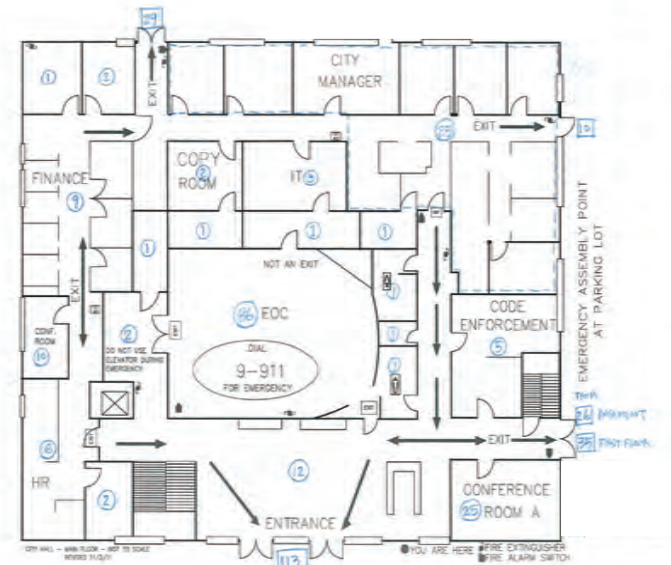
C First Floor Occupancy Load and Exit Diagram
